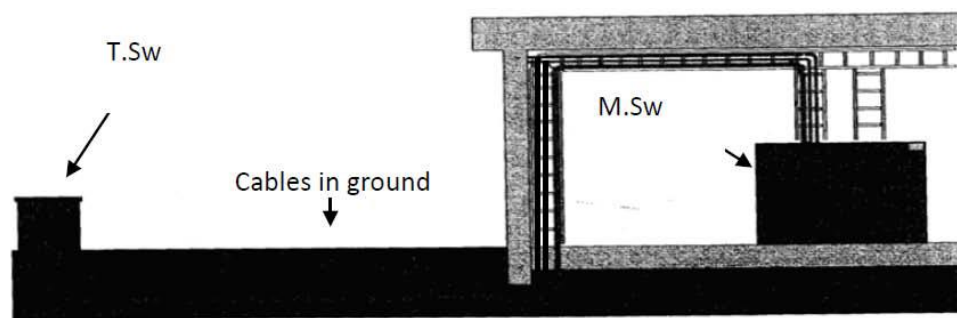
Entry part of a low voltage installation at a company in Fåborg town. Cables connect the transformer switchboard (T.Sw) via cables to the main switchboard (M.Sw) inside the building.
